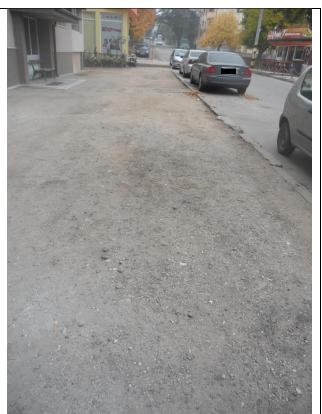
Wide sidewalk without flooring /. Широк тротоар без настилка
